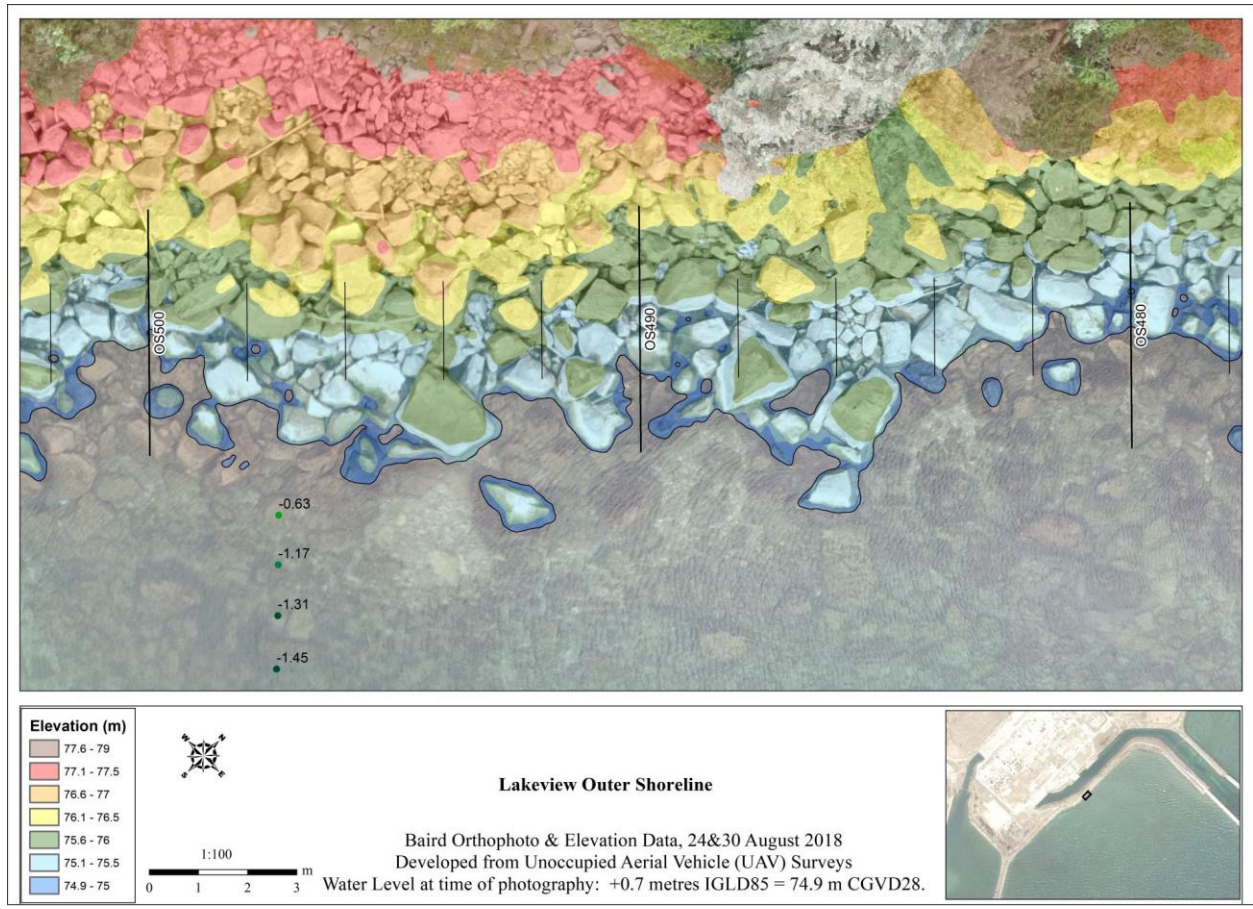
Example of surface elevations of Outer Shore revetment (OS480 to OS500)
